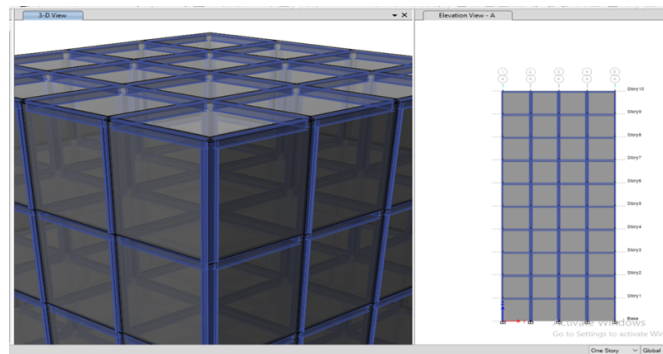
Elevation of G+9 storied Steel bare frame infilled with Ferrocement precast panels on all sides.
